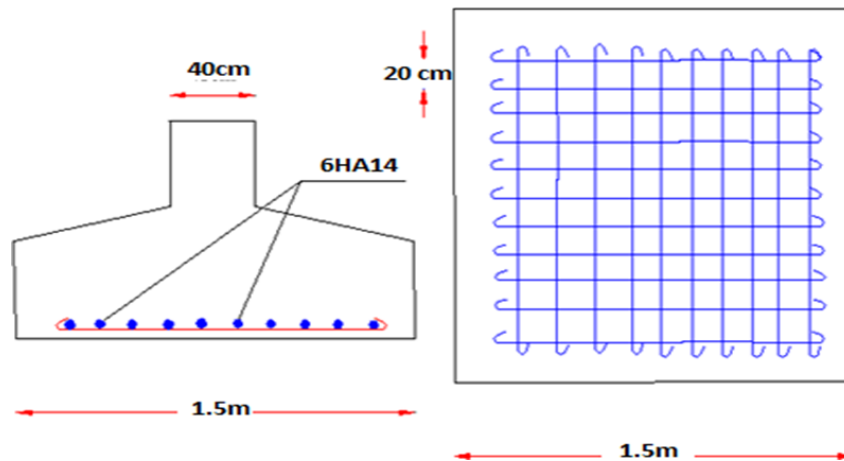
Schematic of reinforcement of the foundation isolated in column
